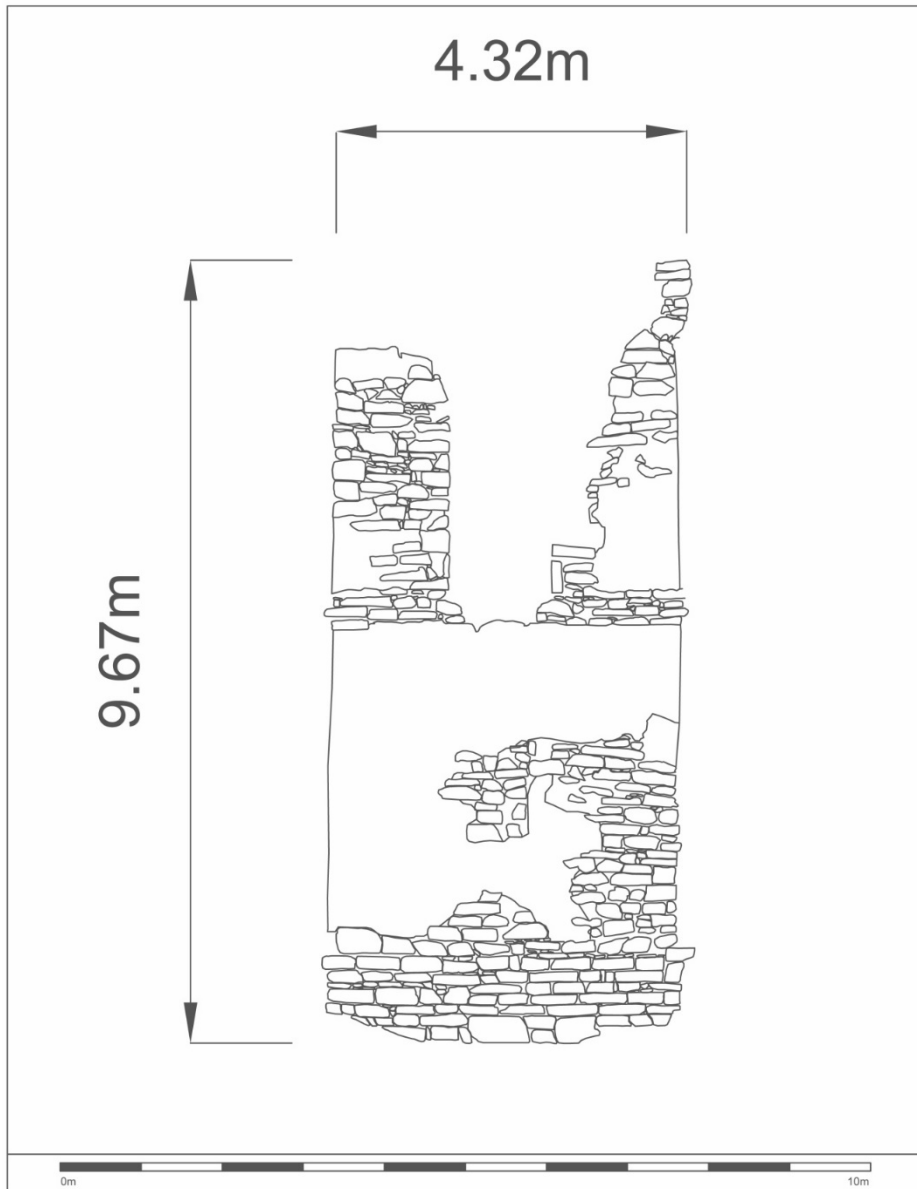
Internal elevation of the west wall of the signal tower at Glash Signal Station.
